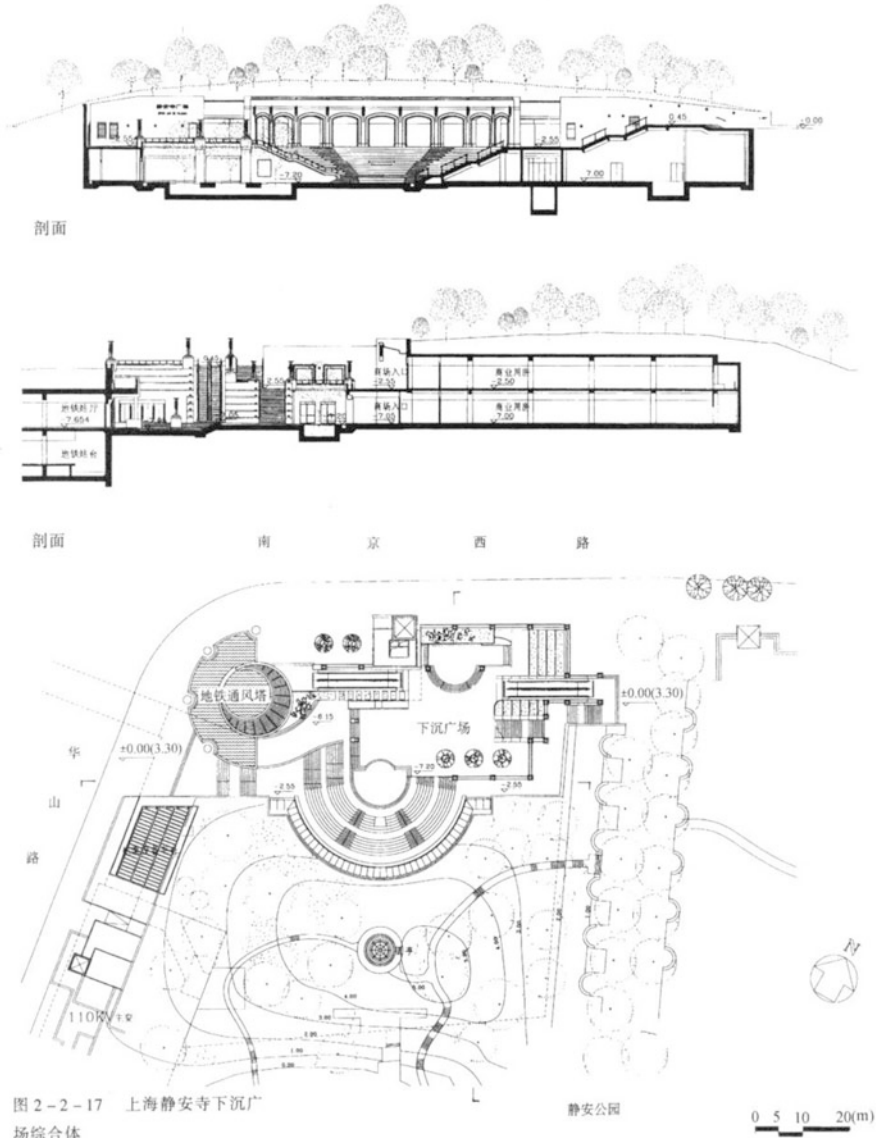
Jing'an Temple subway station cross-sectional view, plans
